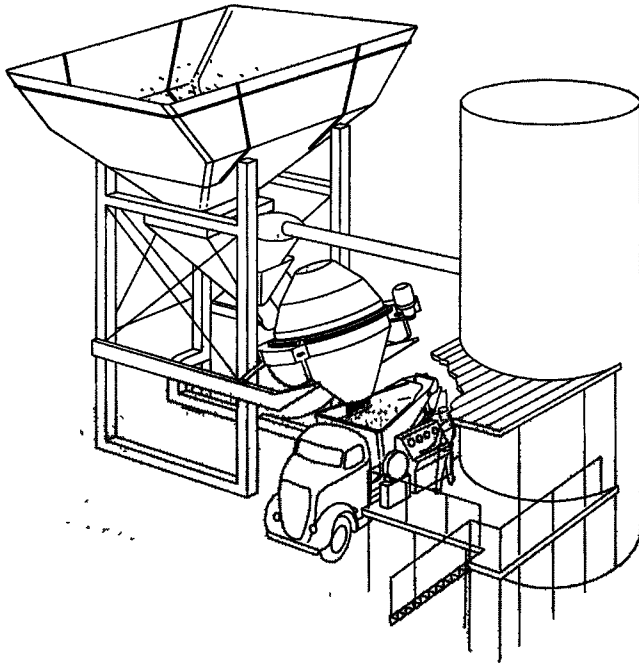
Diagram of elements. Plant - operator and test floor - Agitor delivery.
